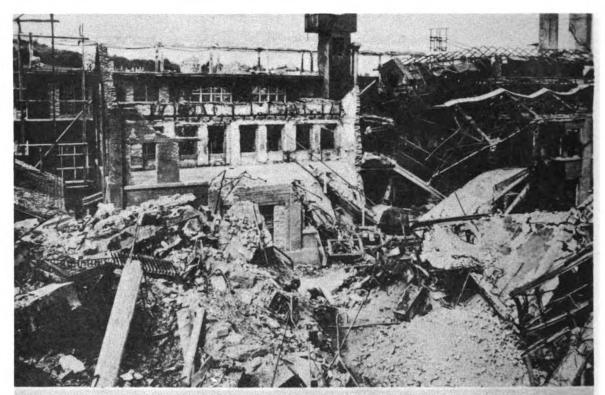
View showing extensive blast and fire damage to reinforced concrete frame and steel frame structures. Note bomb crater, lower left corner and repairs to damaged curtain walls. Reproduction of captured photo.
